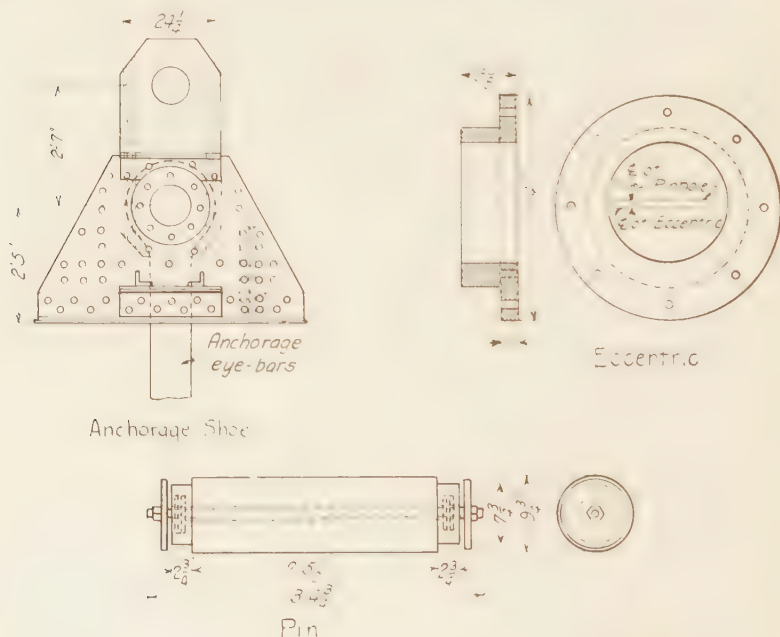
Anchorage adjustment, Sewickley Bridge.
